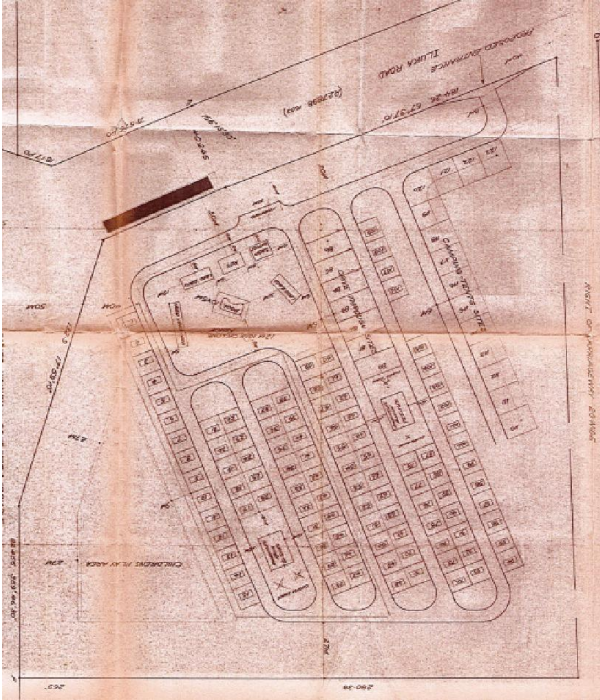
Approved Caravan Park DA83/464 & DA2021/0184
